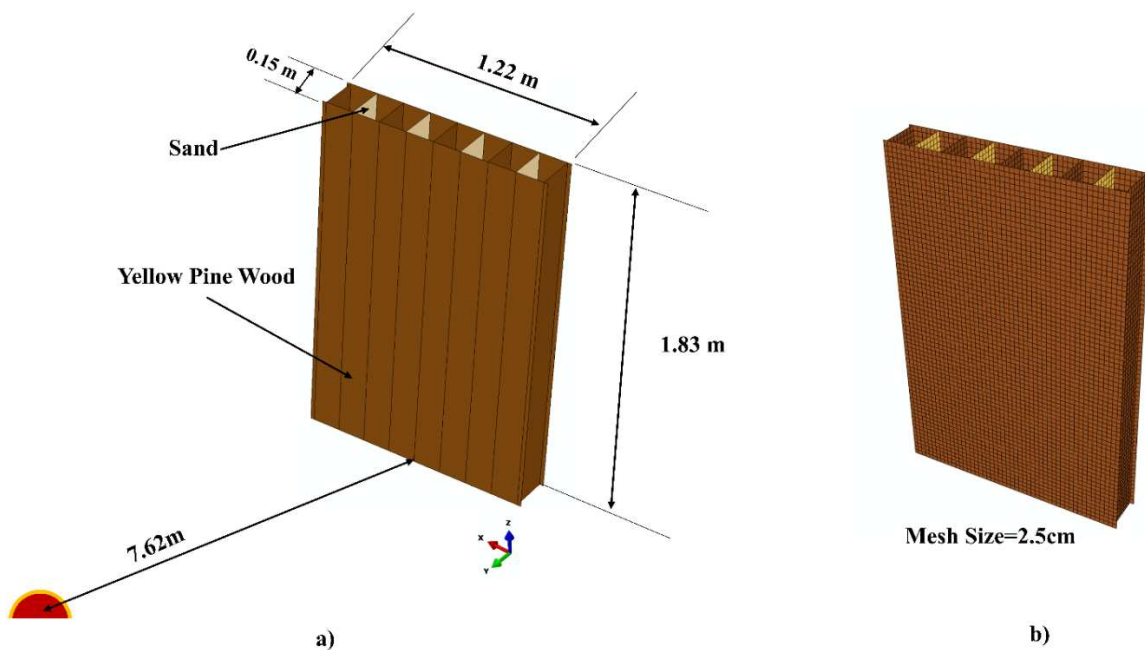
Finite element geometrical details for wood-sand-wood wall model.
